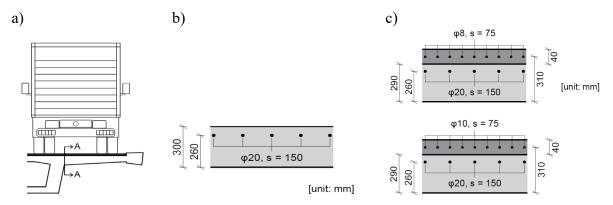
(a) Box girder bridge with cantilever slab, (b) original RC cantilever slab cross section at A-A section, and (c) RC slab strengthened with R-UHPFRC (two rebar contents).
